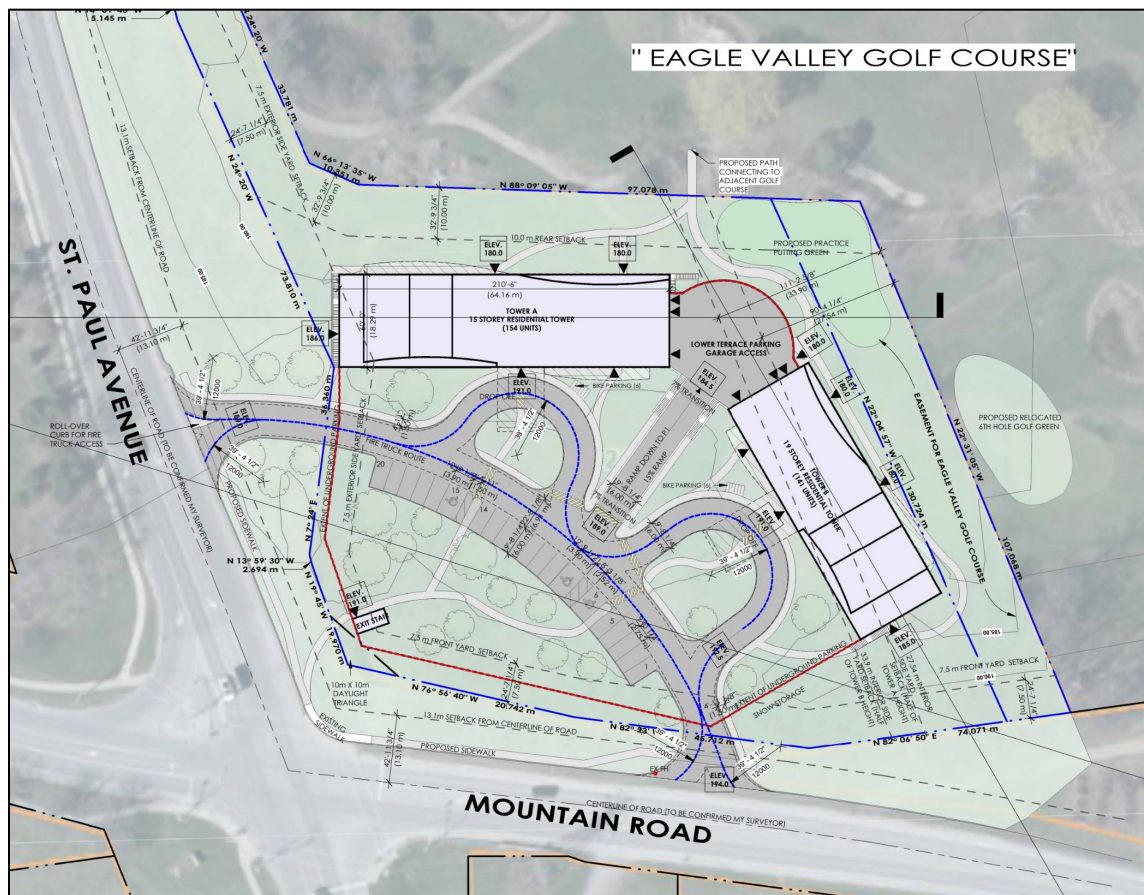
Proposed development on Subject Lands showing Towers A and B, driveway and parking areas.
